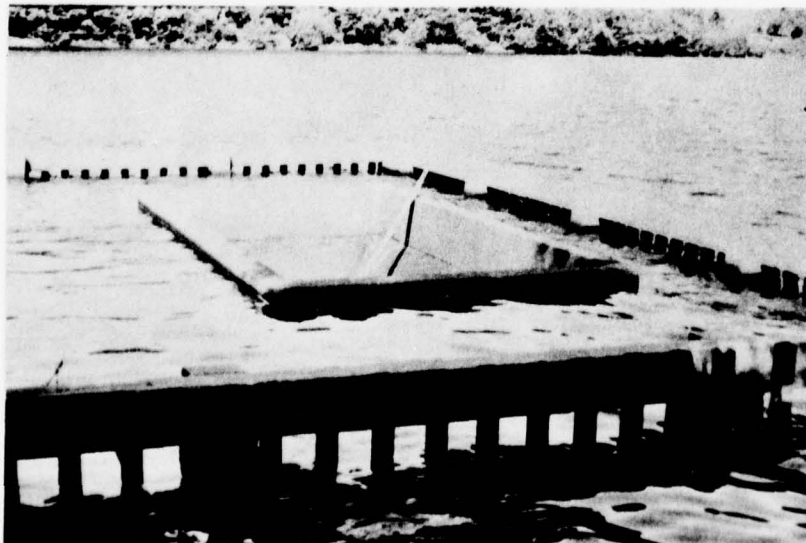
Rectangular drop-inlet spillway intake and concrete trash guard.
